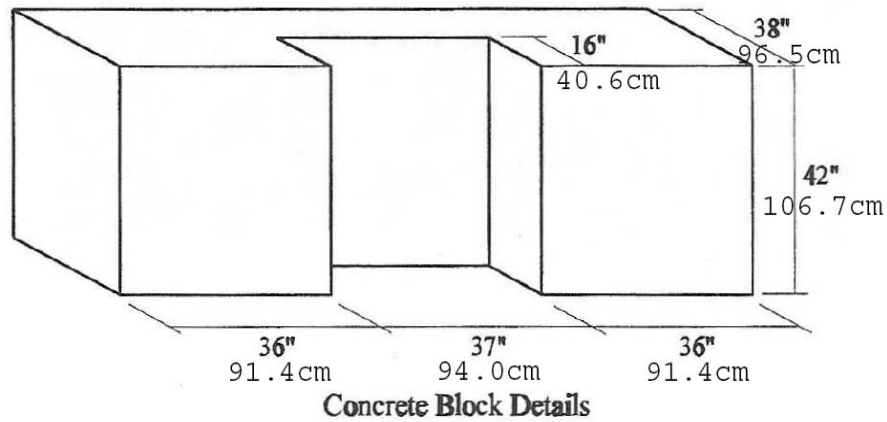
Concrete Block Geometry, Rock Creek Bridge
